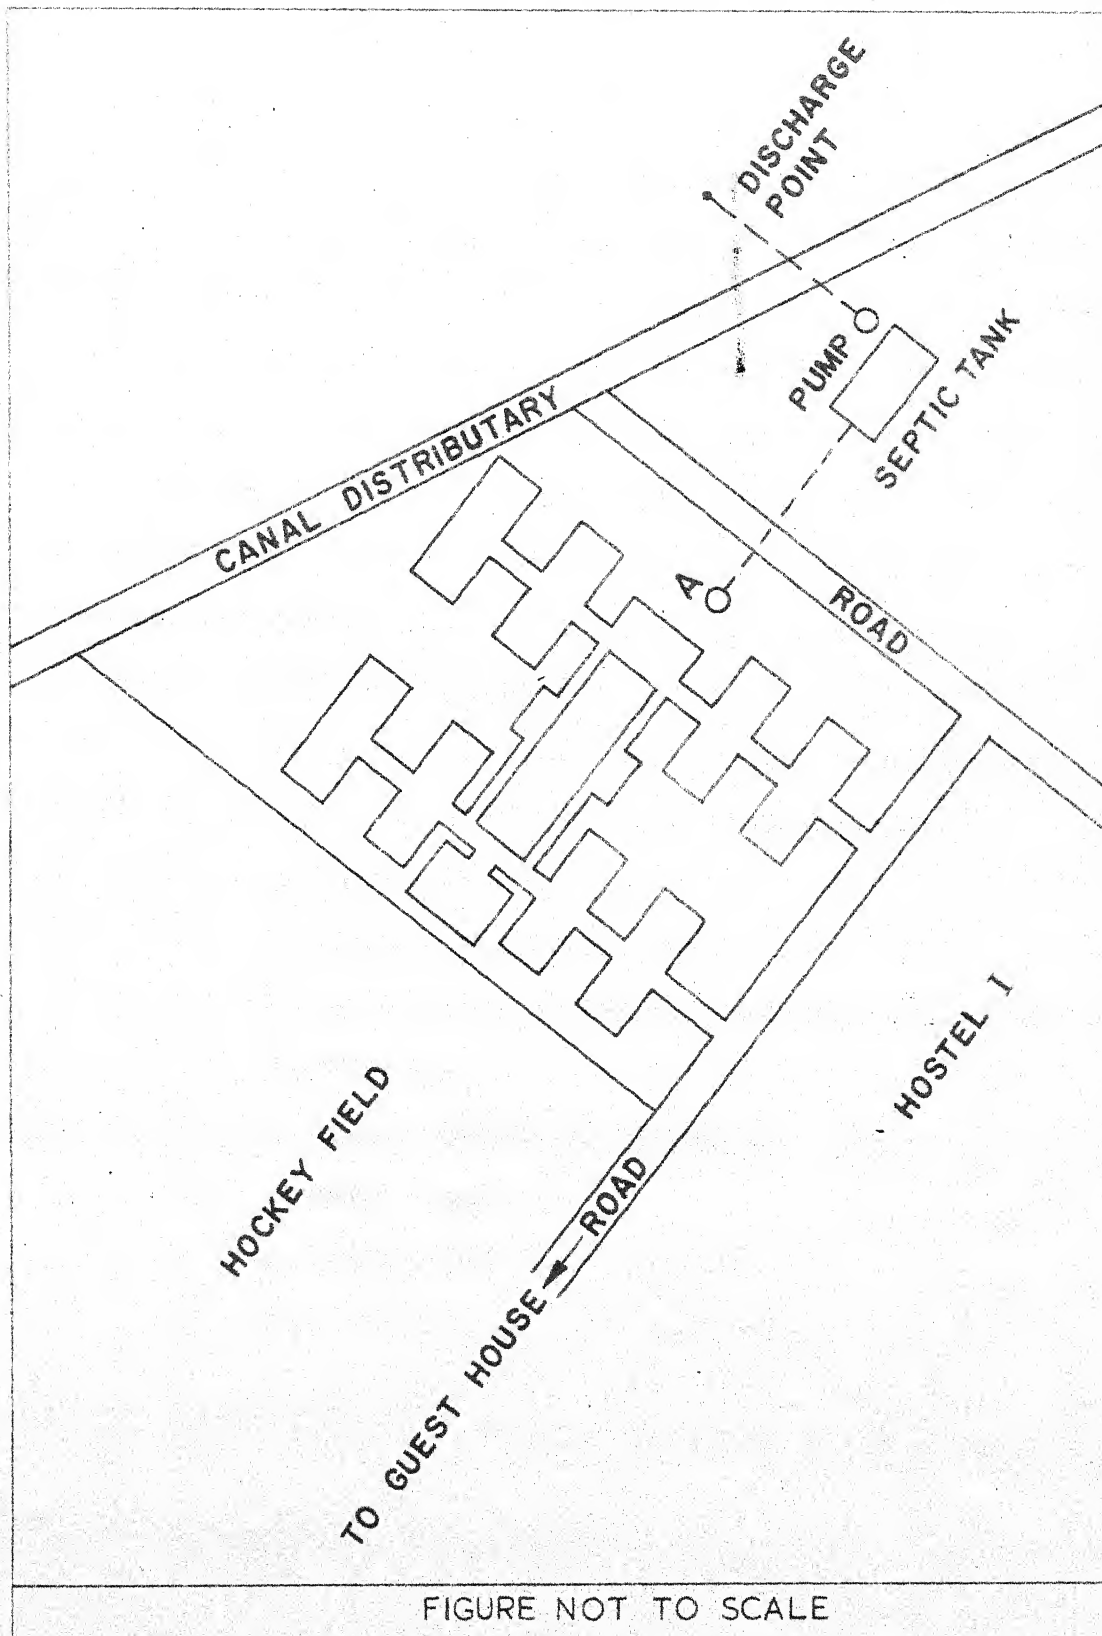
FIG. I SITE PLAN OF HOSTEL IV AND WASTE DISPOSAL SYSTEM
